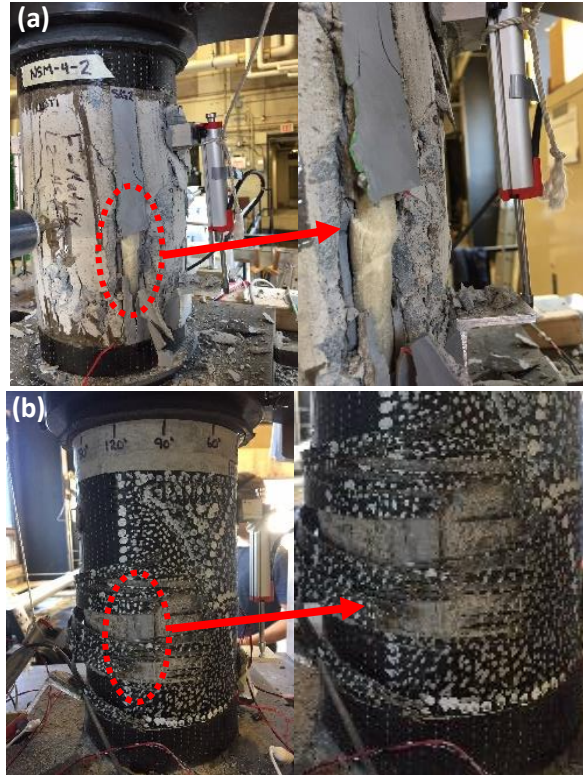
Failure modes: (a) NSM specimen and (b) NSM-wrapped specimens.
